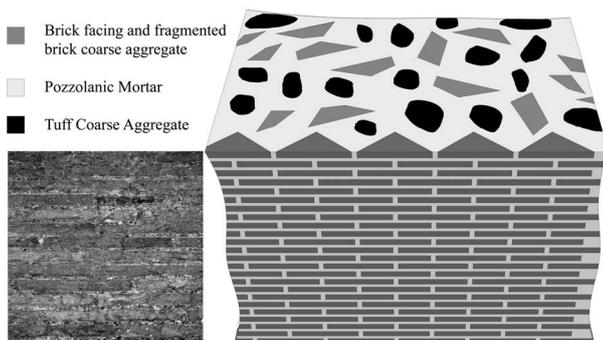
Photo of brick-faced concrete wall (bottom left) with schematic showing concrete nucleus. A typical facing brick is about 15cm wide.
